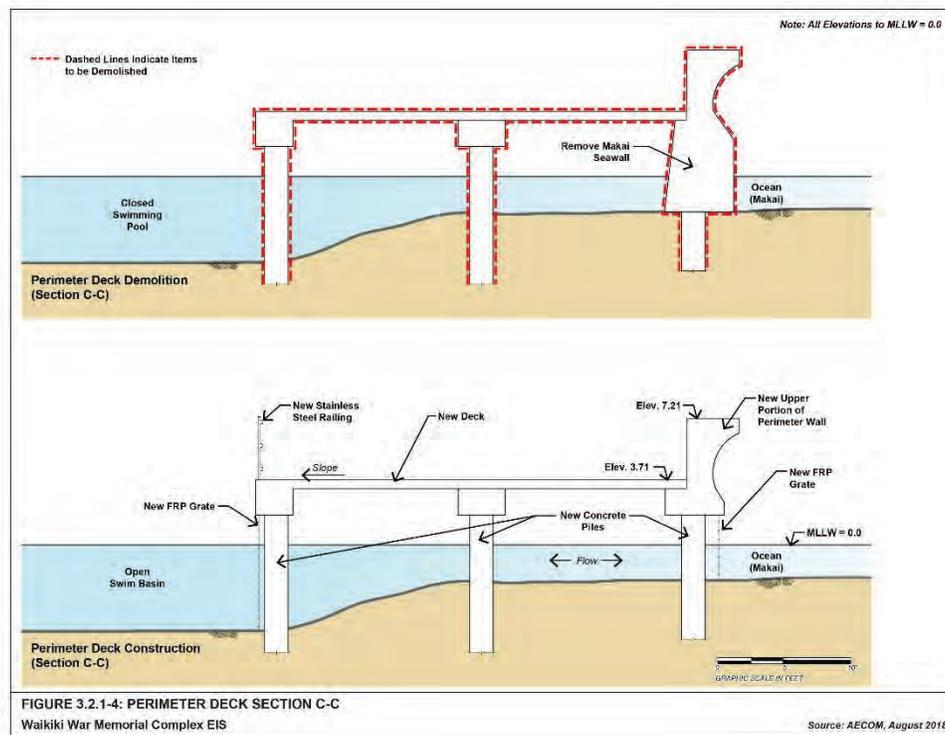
Alternative 1 – Perimeter Deck, section view C-C.
